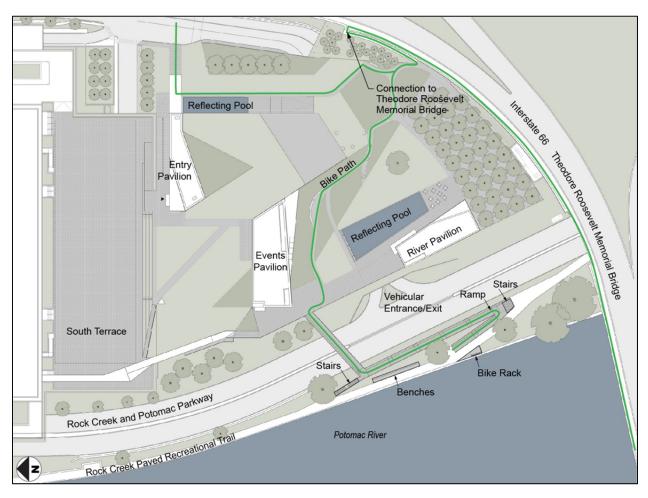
Alternative C: Bridge Access with Ramp and Stairs
